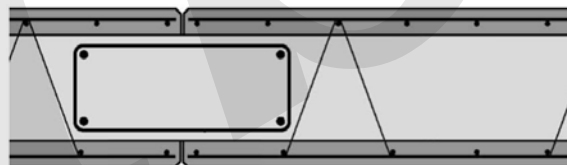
Possible joint detail between adjoining twin wall panels with prefabricated rebar cage at joint connection.
